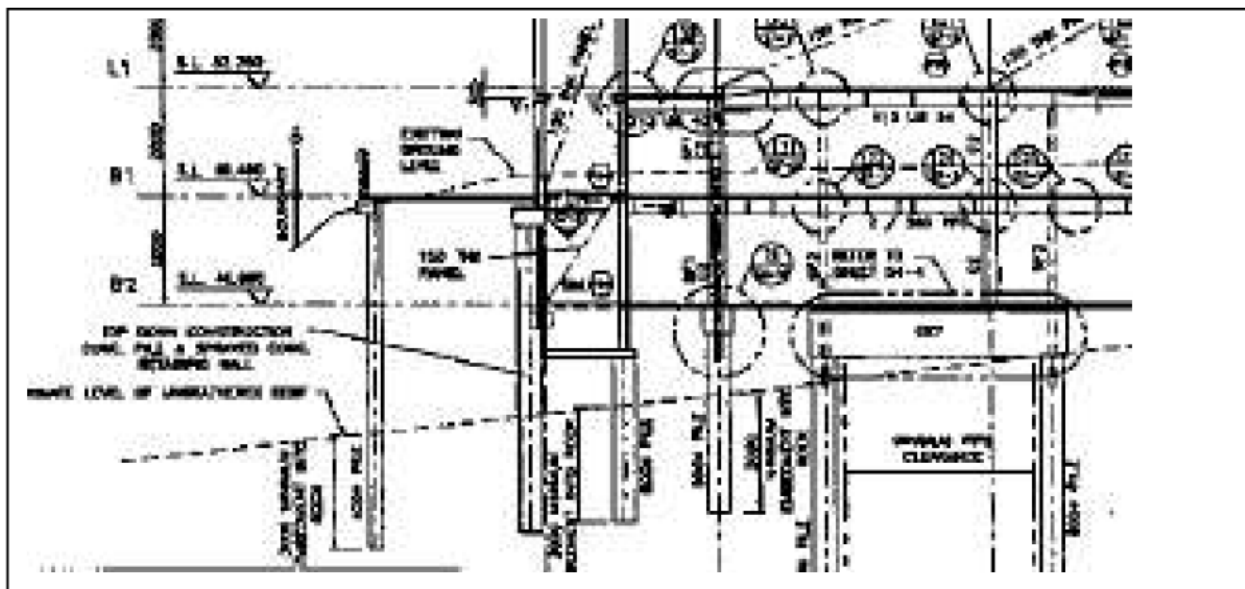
Drawing Extract – Access ramp and apartment structure founding piles, 2005
